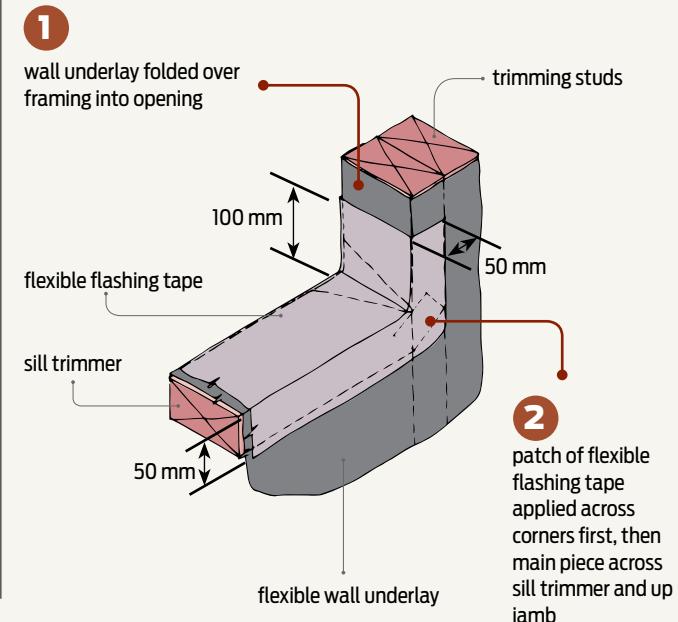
Steps 1–2: Install wall underlay and flexible flashing tape.
